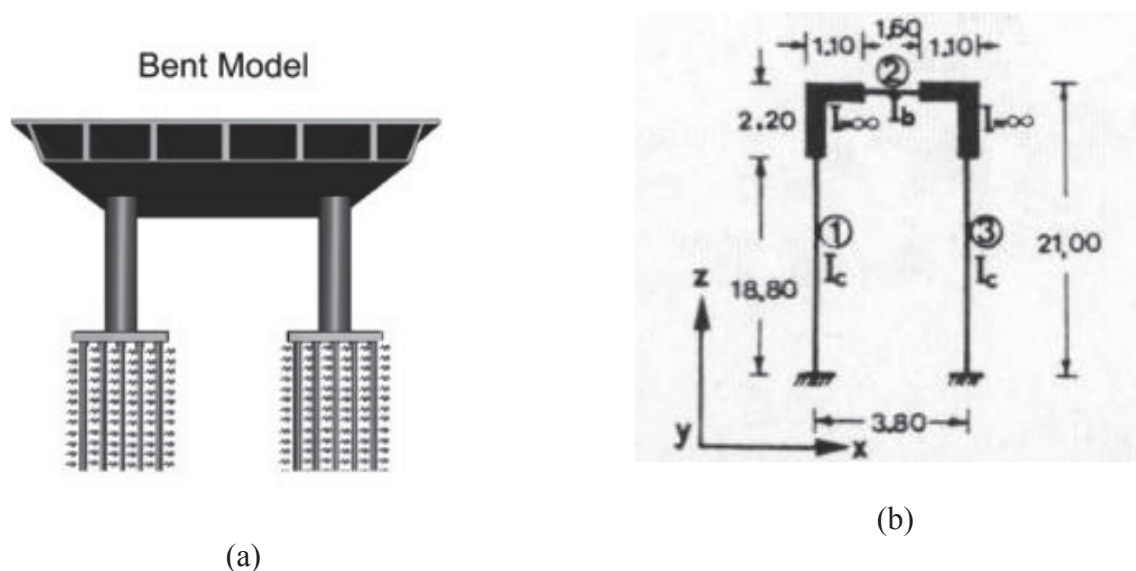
Two-columns framed bridge piers considered: (a) in [43], (b) in [44], Evripos bridge.
